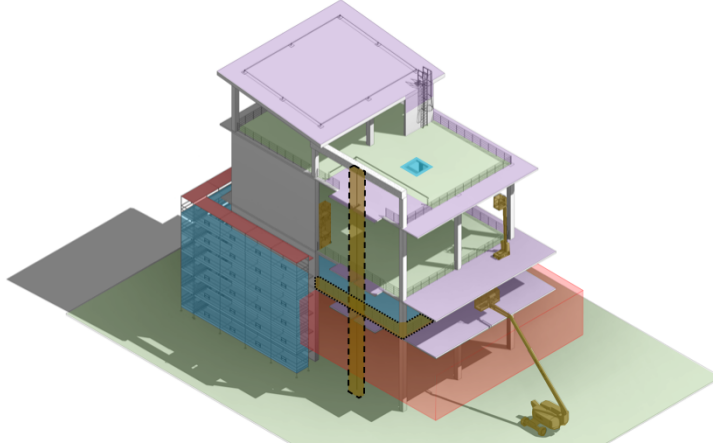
Sample floor-plan indicating various safety zones in a building.
